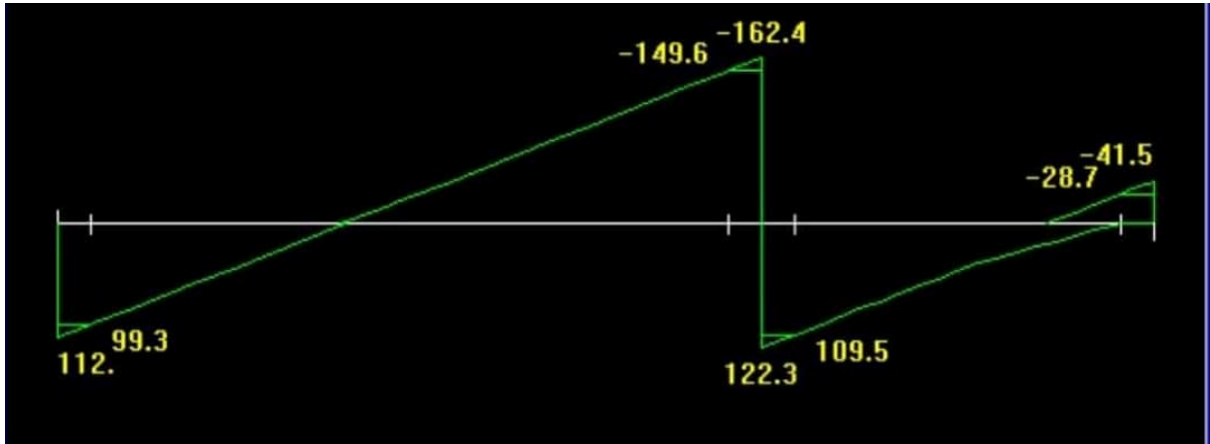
Moment & Shear Envelope for Beam (B3)
